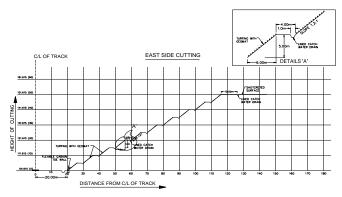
Final Cross Section adopted (Pomendi Cutting / East Side)
